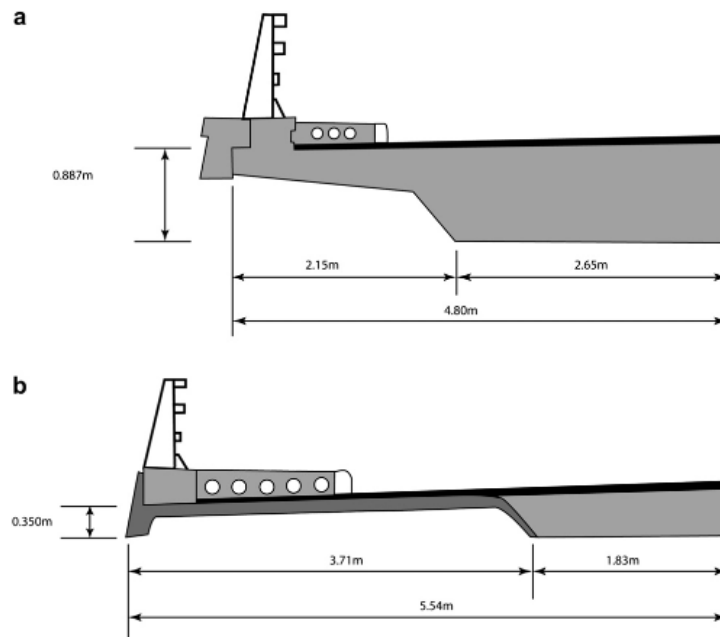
A) Cross section of normal concrete bridge, B) Cross section of UHPC bridge [62]
